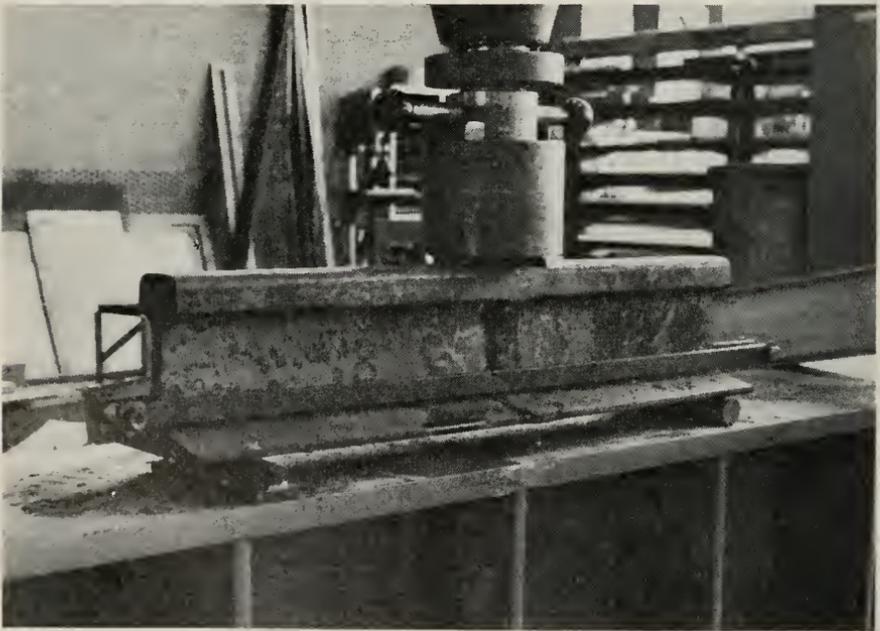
View of loading arrangement with Amsler pulsating hydraulic jack.
